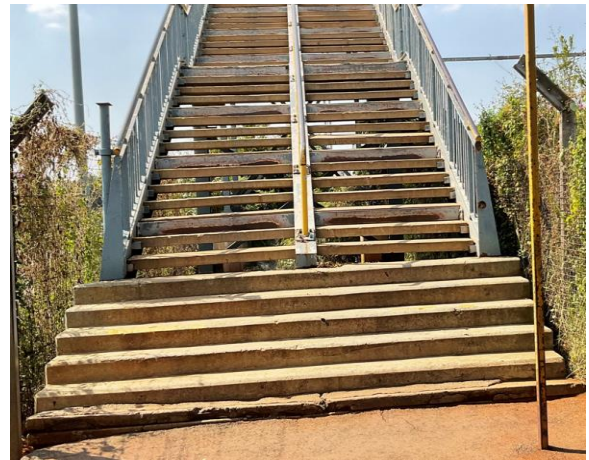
Bridge stairs – precast concrete members have cracks
